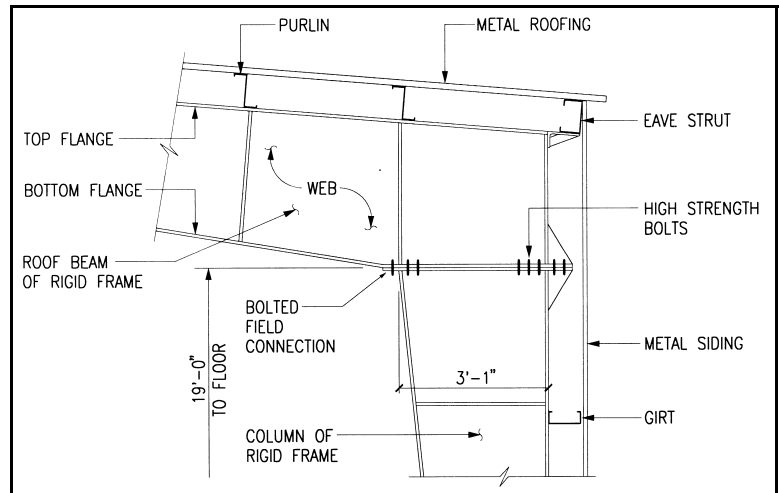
Section through eaves showing construction details. Insulation and bracing are not shown.
